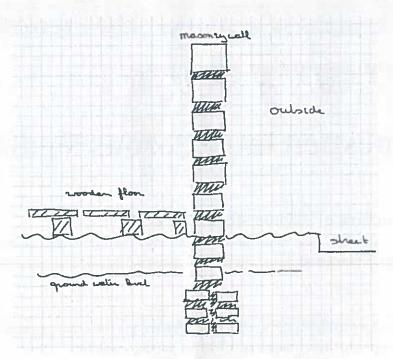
A cross section of the outer wall where the salt damage appeared after the restoration of the building
